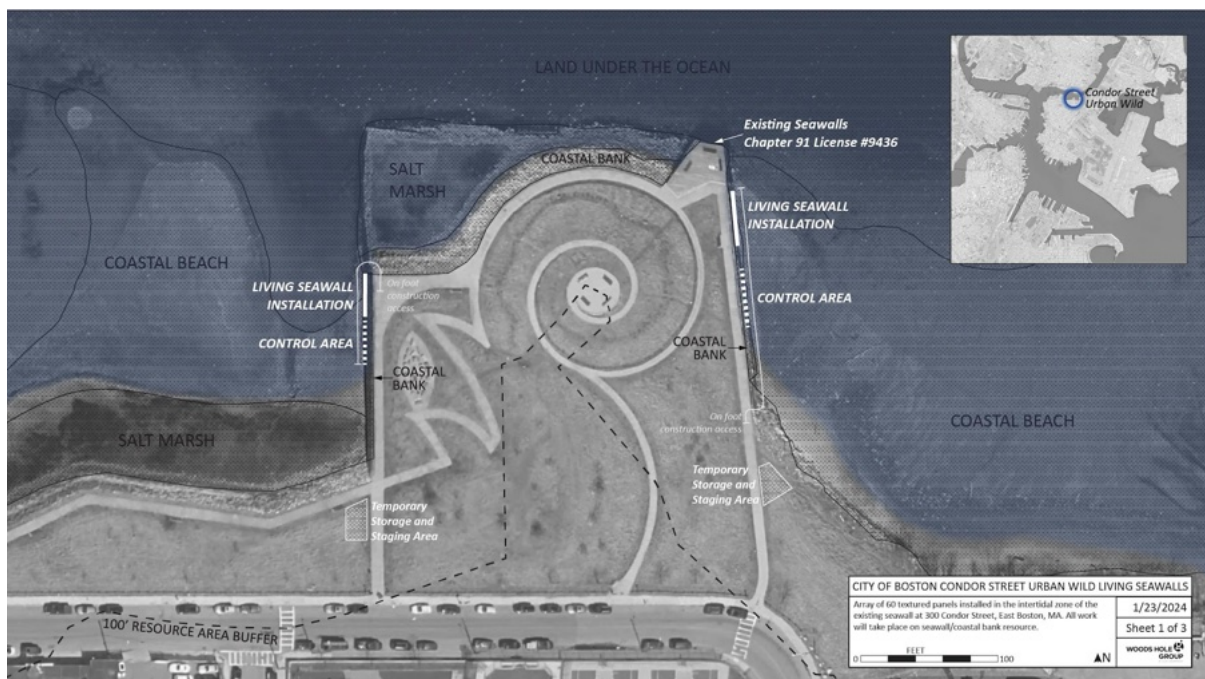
BACI design of site selection for sampling at Condor Street Urban Wild. Two Living Seawalls were installed on the east and west sides of the park.
